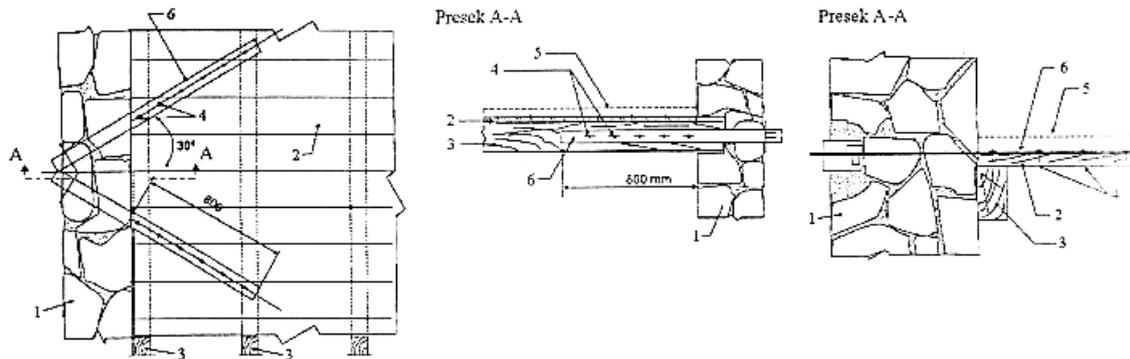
Connecting the wooden floor to the masonry wall; 1 – existing wall, 2 - Existing wooden planks, 3 – Existing wooden beams, 4 – Nails, 5 – New concrete slab, 6 – Steel strip
